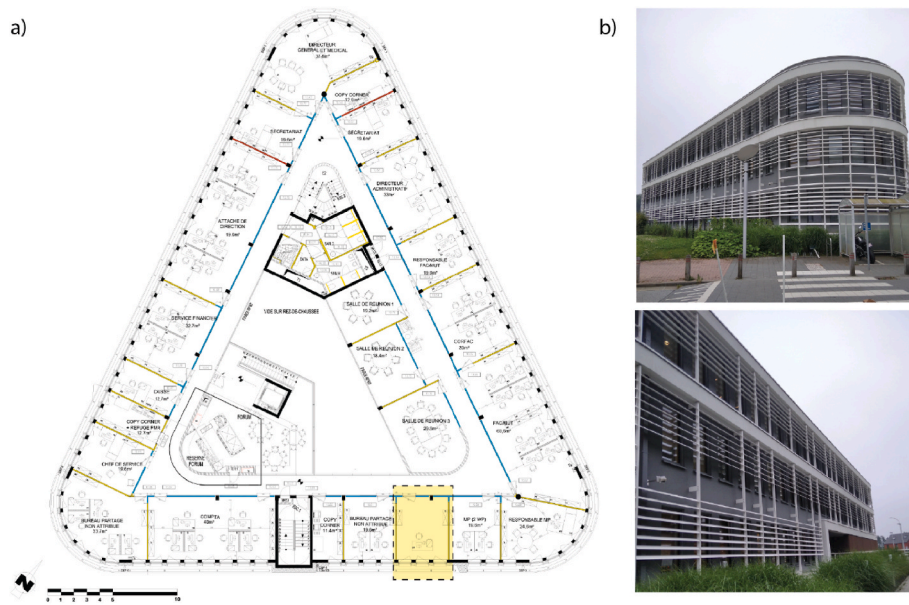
Case study building: a) First-floor plan of Clinique Saint-Pierre building (highlighted area represented the selected office room); b) Perspective view of the building.
